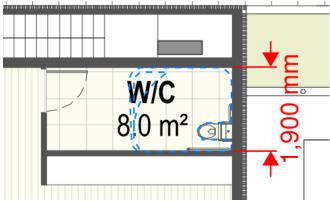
WC shall have minimum clearances and a WB shall be provided to the accessible facility.
